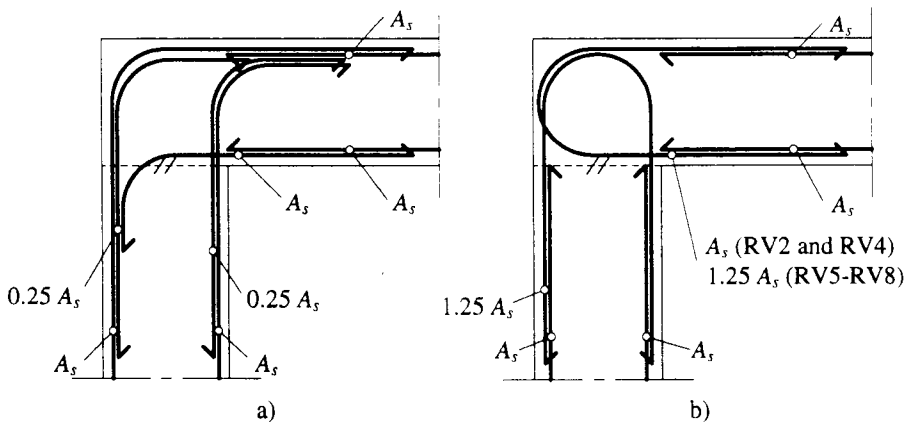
Detailing of the reinforcement according to: a) the conventional method, and b) the new alternative.
